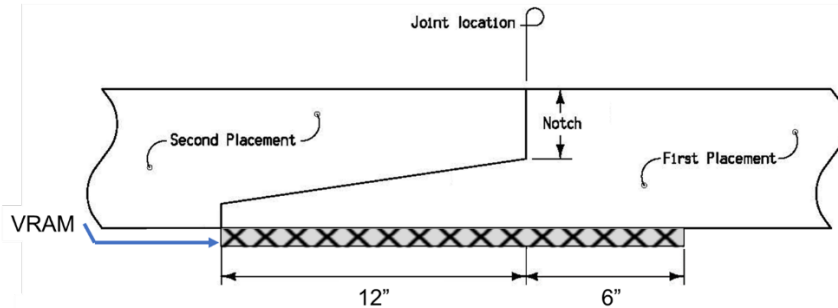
Example illustration of VRAM with a compacted notched-wedge joint. Drawing not to scale. Cross sections will vary. Refer to plans.
